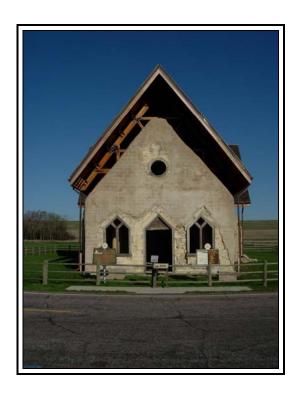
Before: The ruins of the Fort Randall Chapel. Note the deteriorated condition of the masonry surrounding the window and door openings.
